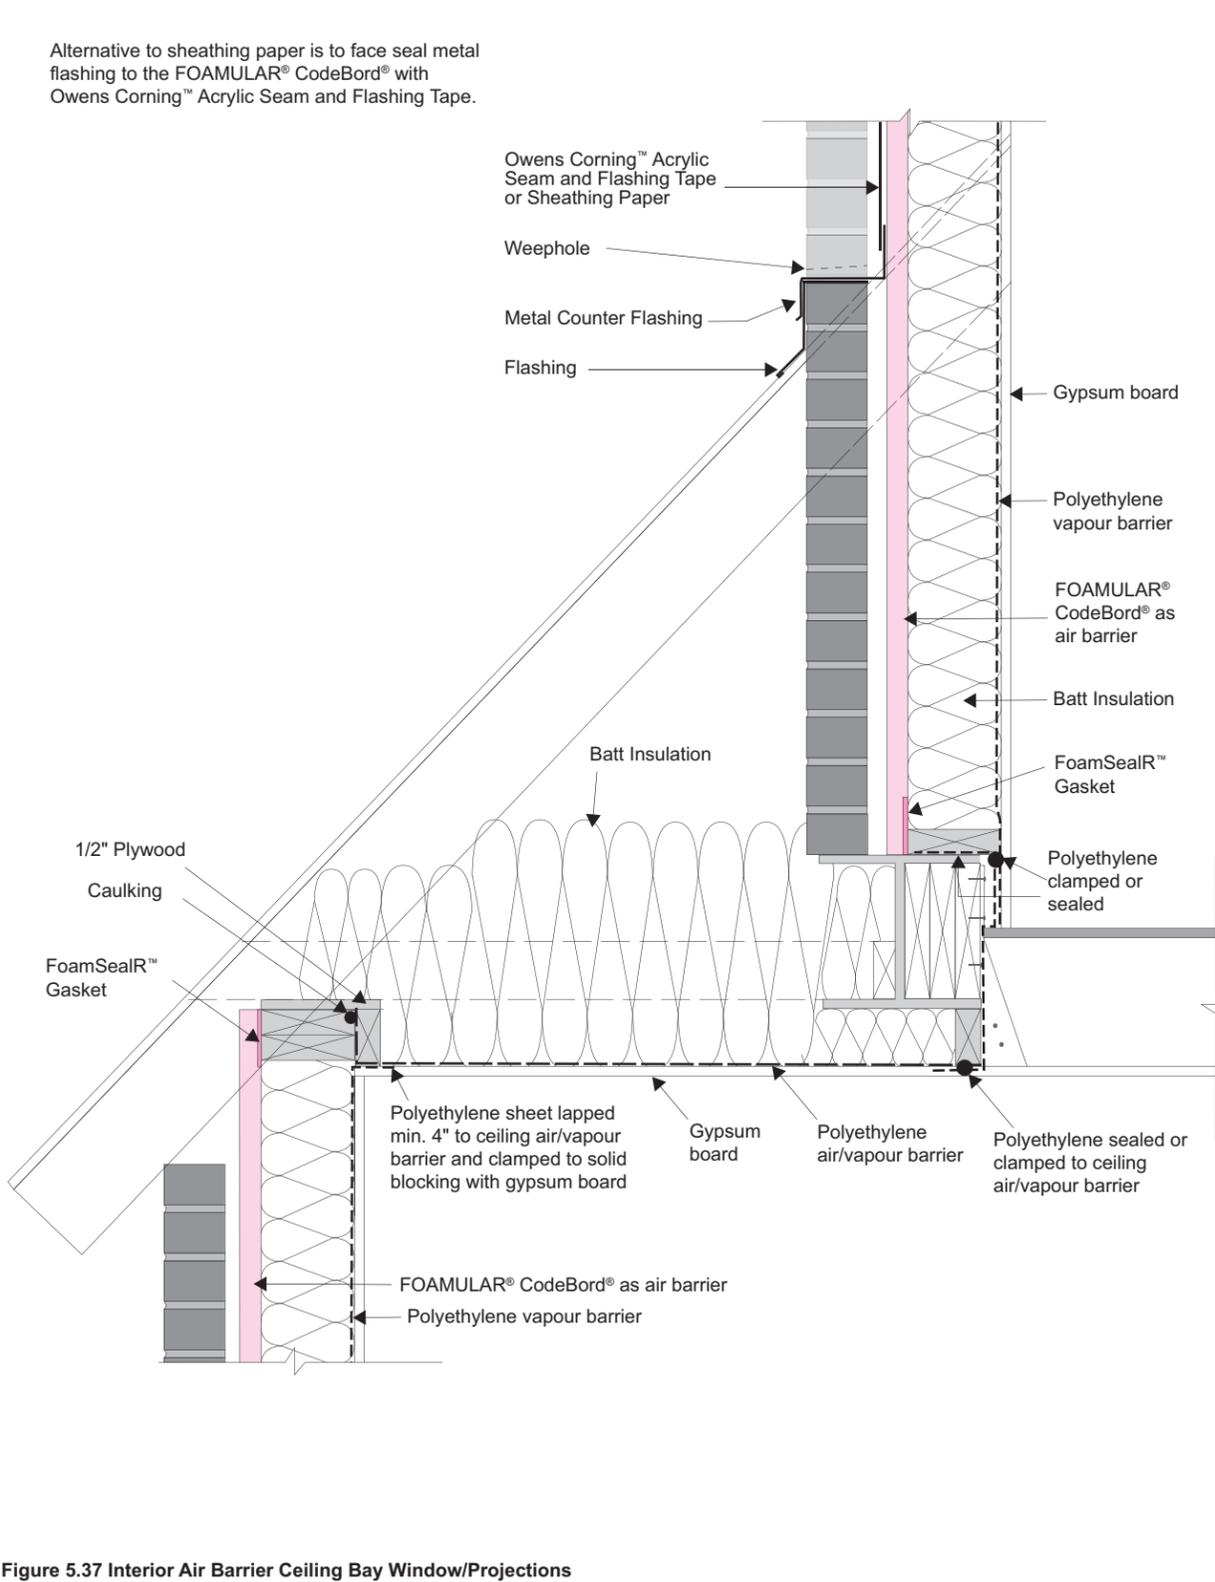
Interior Air Barrier Ceiling Bay Window/Projections
